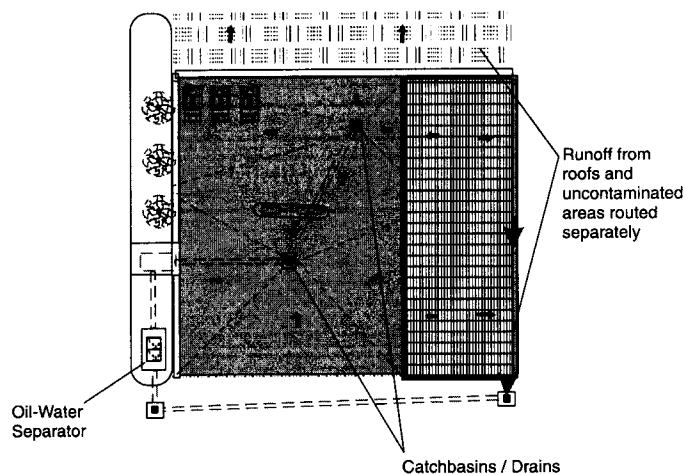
Example of site-drainage plan for runoff treatment (The area shaded in grey is identified where runoff from the pavement has the potential to be contaminated).
